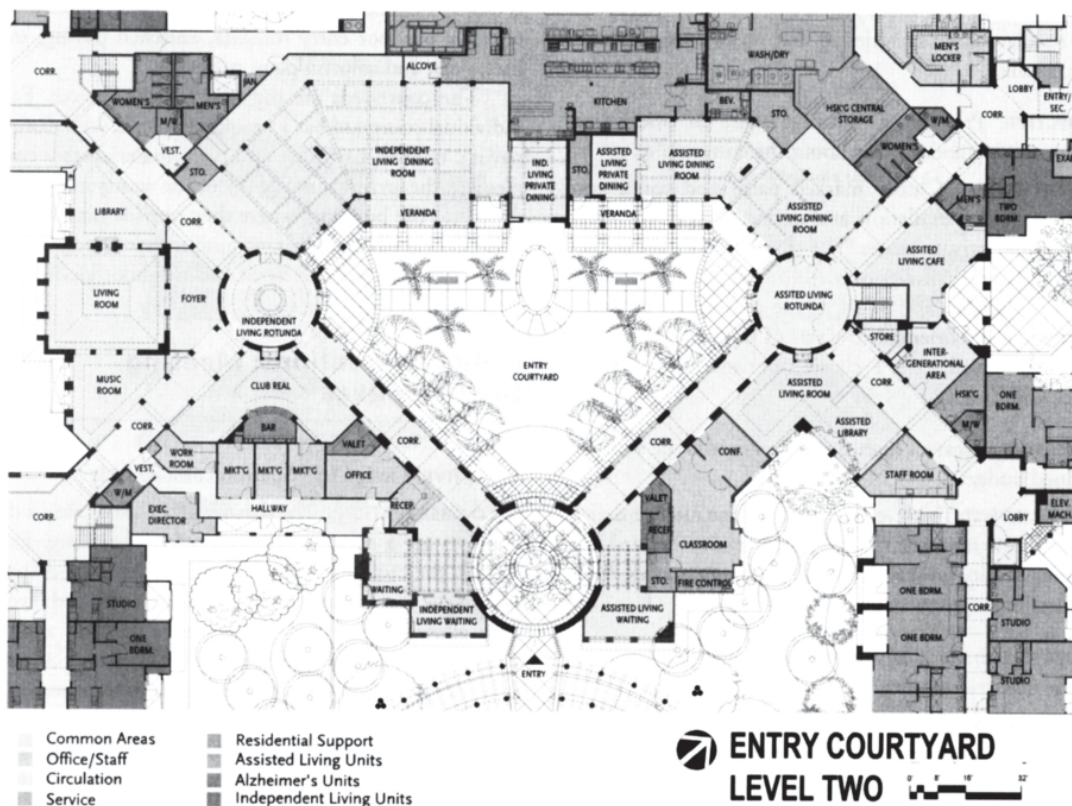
Campus entry courtyard plan *Courtesy of Mithun
